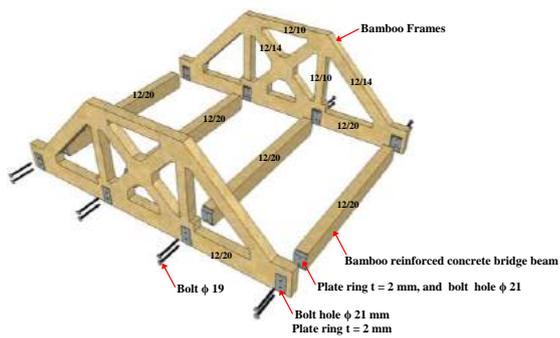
Model of the precast bridge made from bamboo-reinforced concrete.
